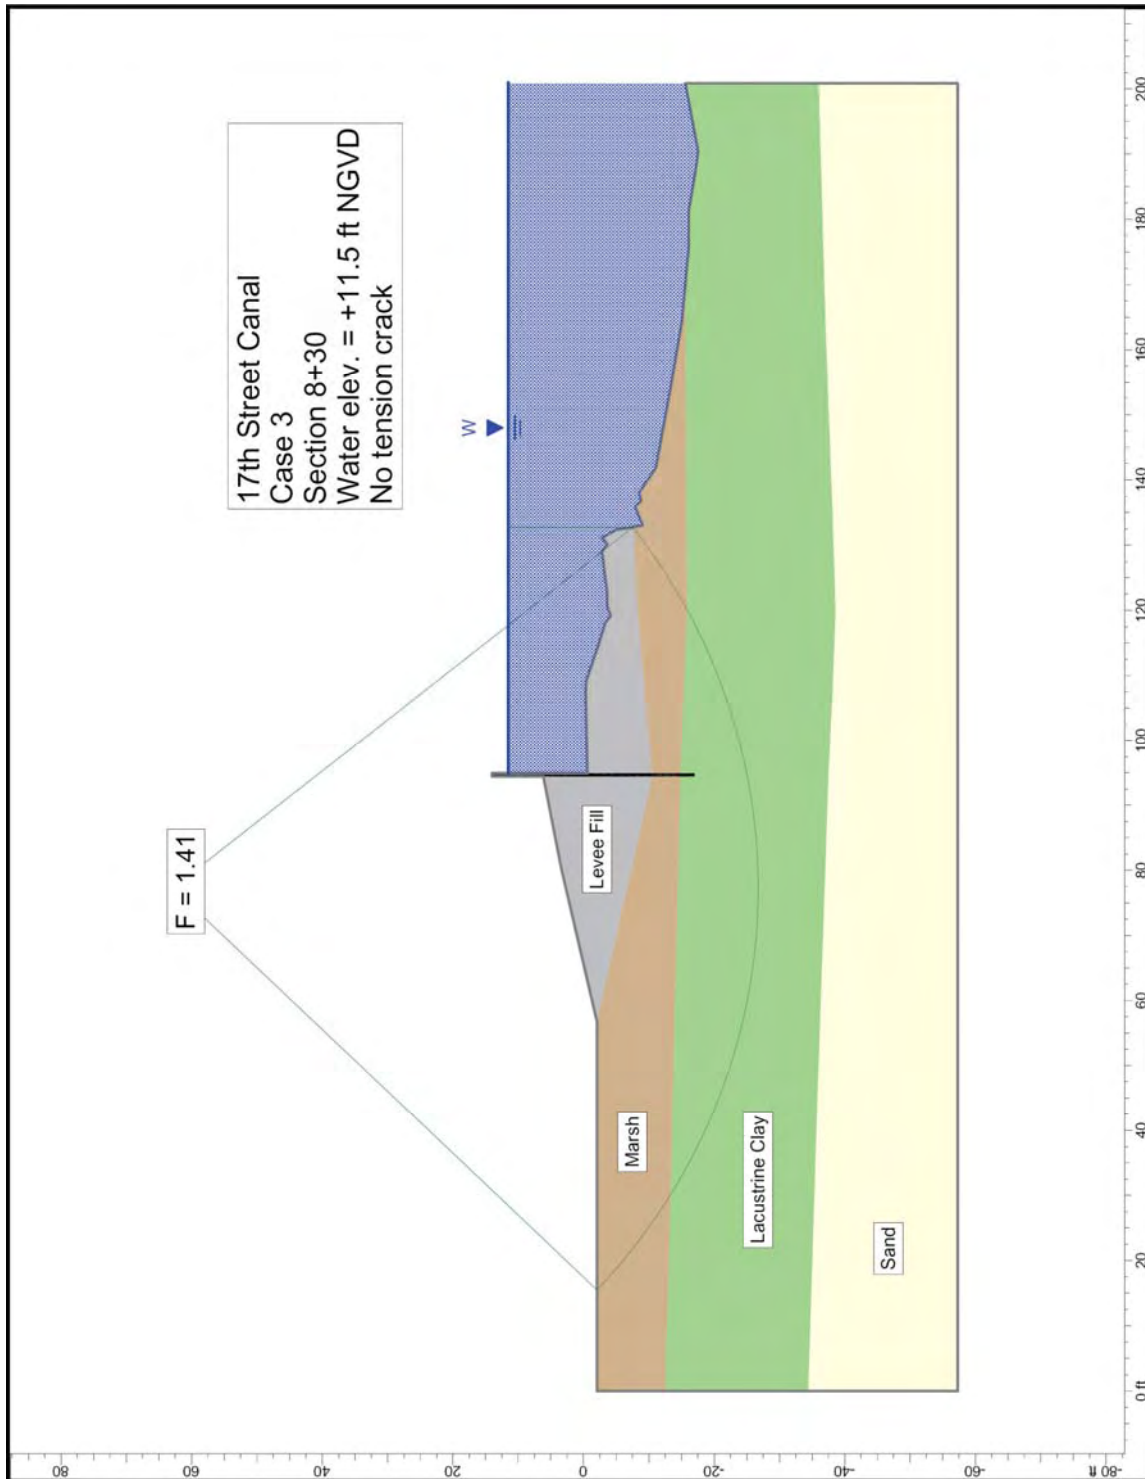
Critical circle for 17th Street Canal Station 8+30 – water elevation 11.5 ft, no tension crack.
